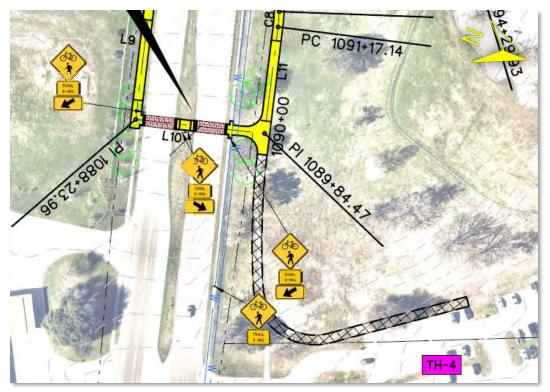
Future Connection to Z Boaz Park Parking Lot
